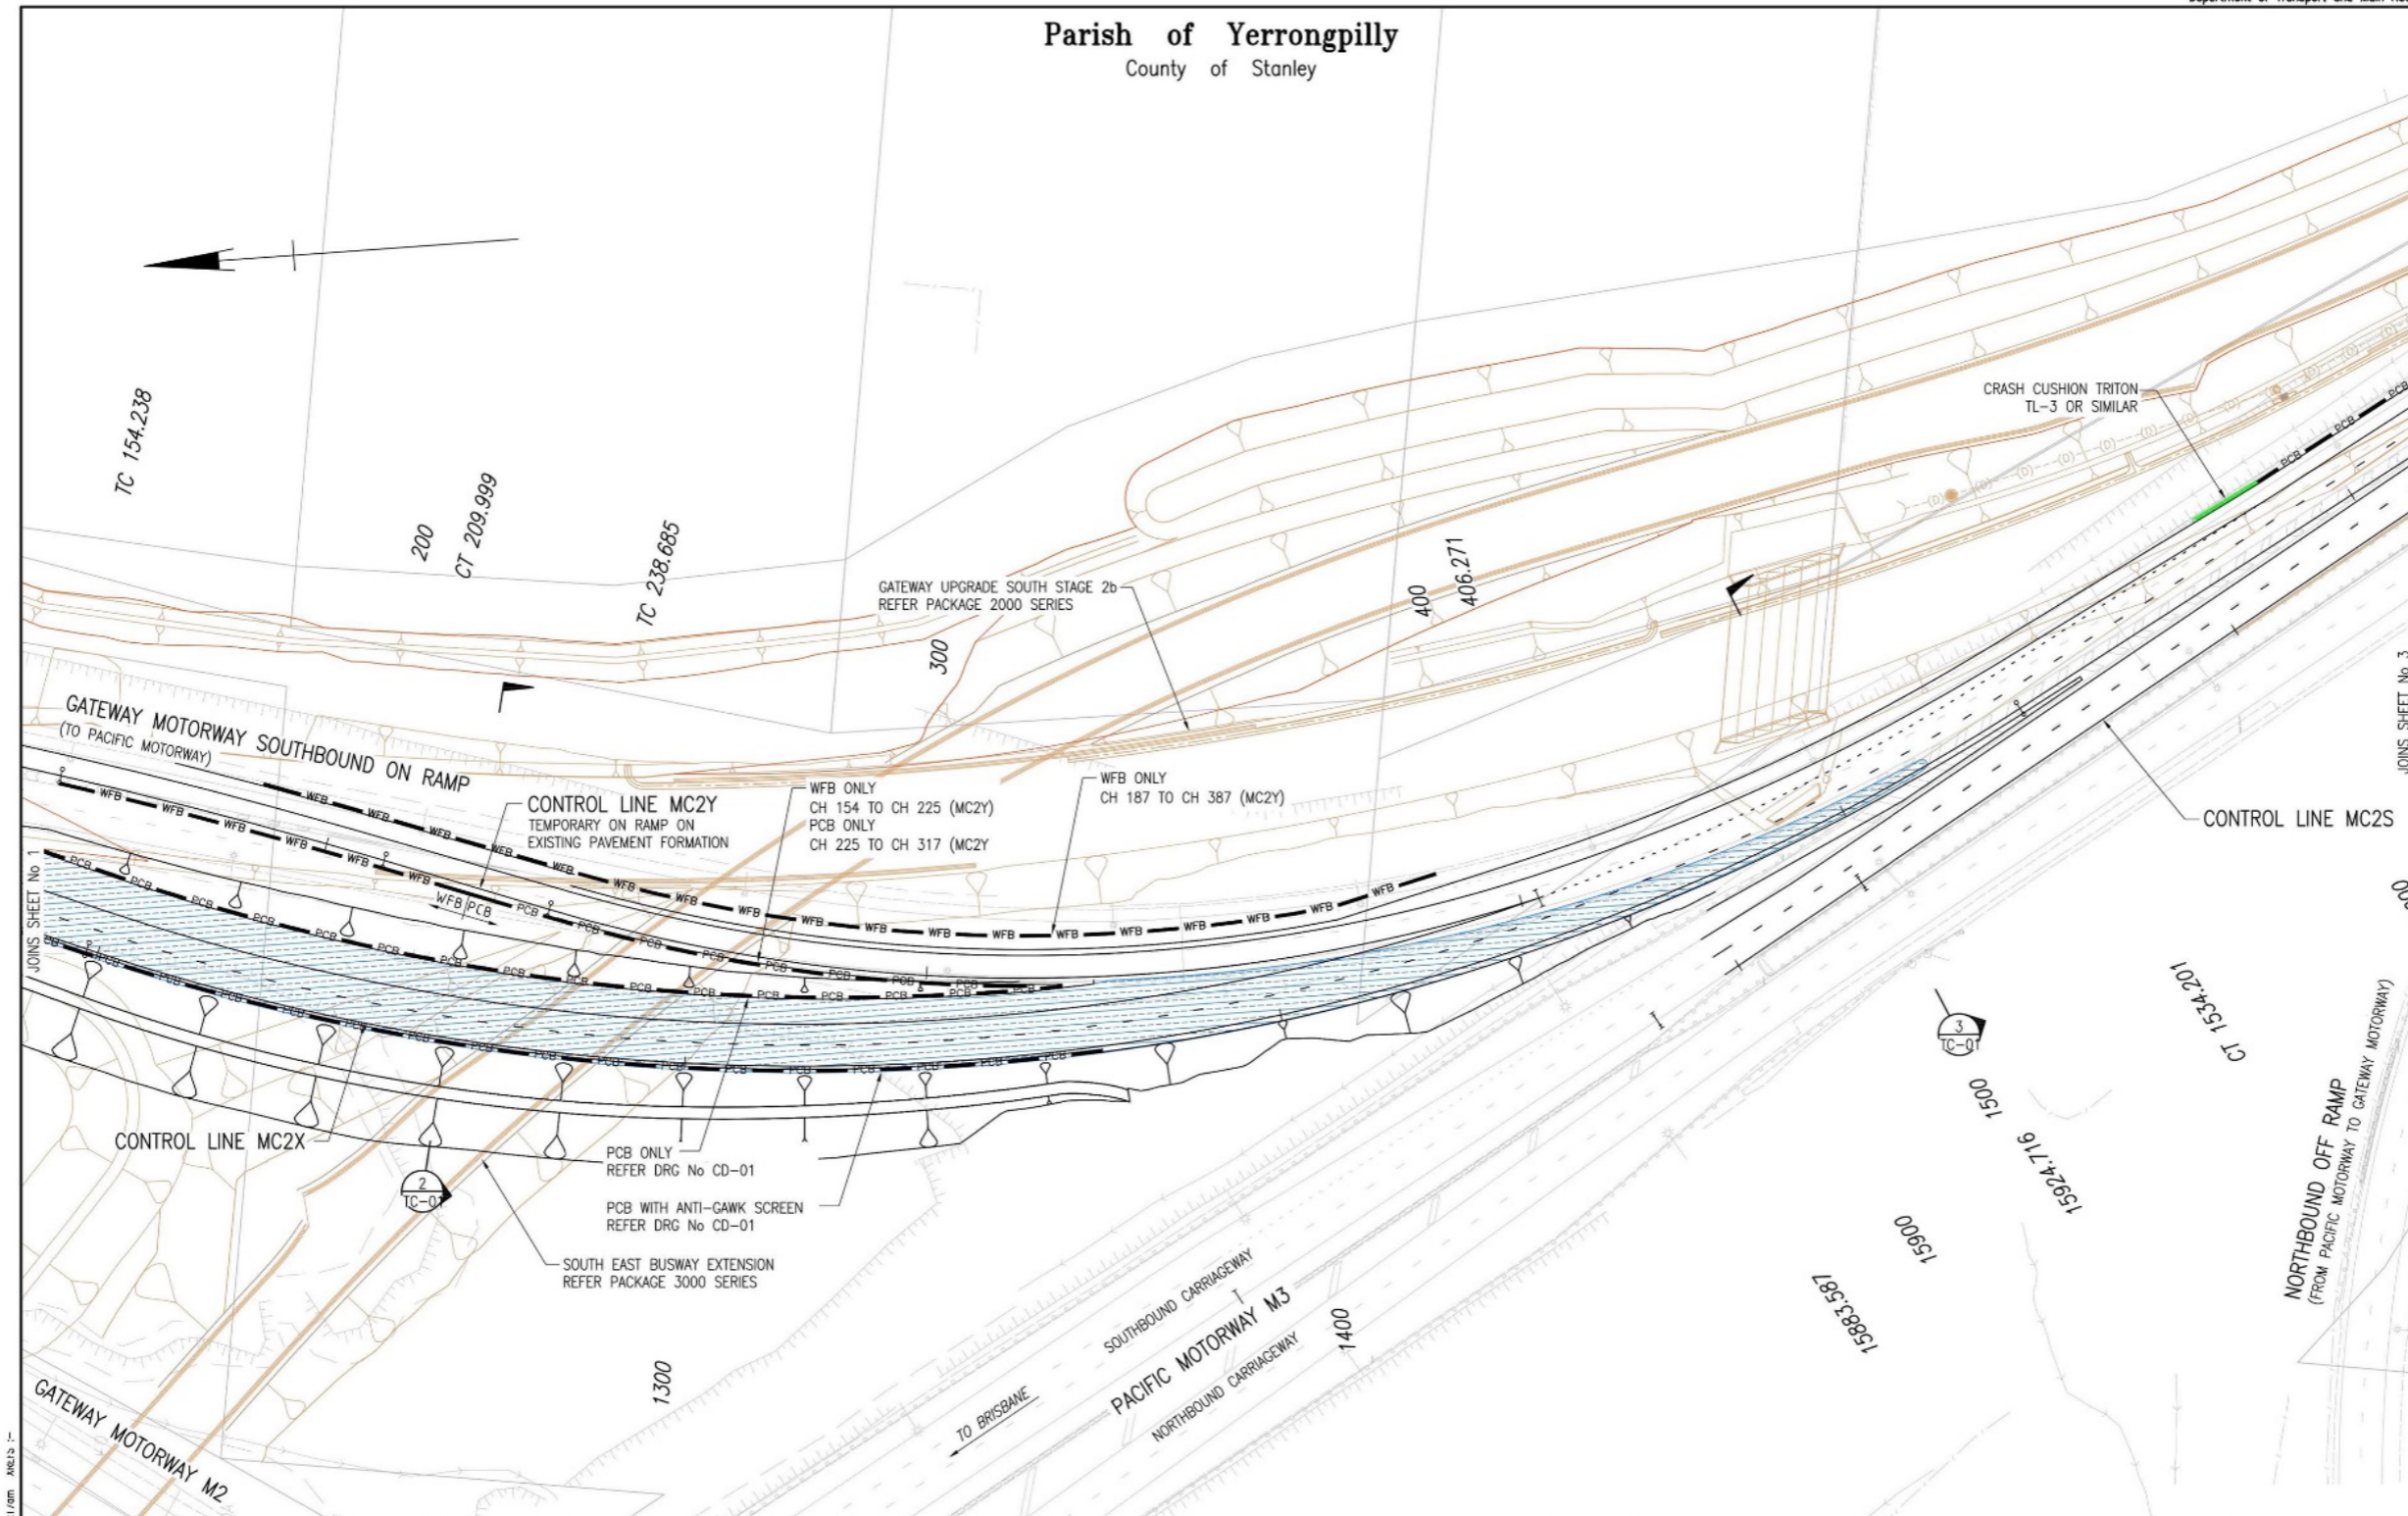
(c) – Construction staging – generic example 2 – sheet 1 of 2
